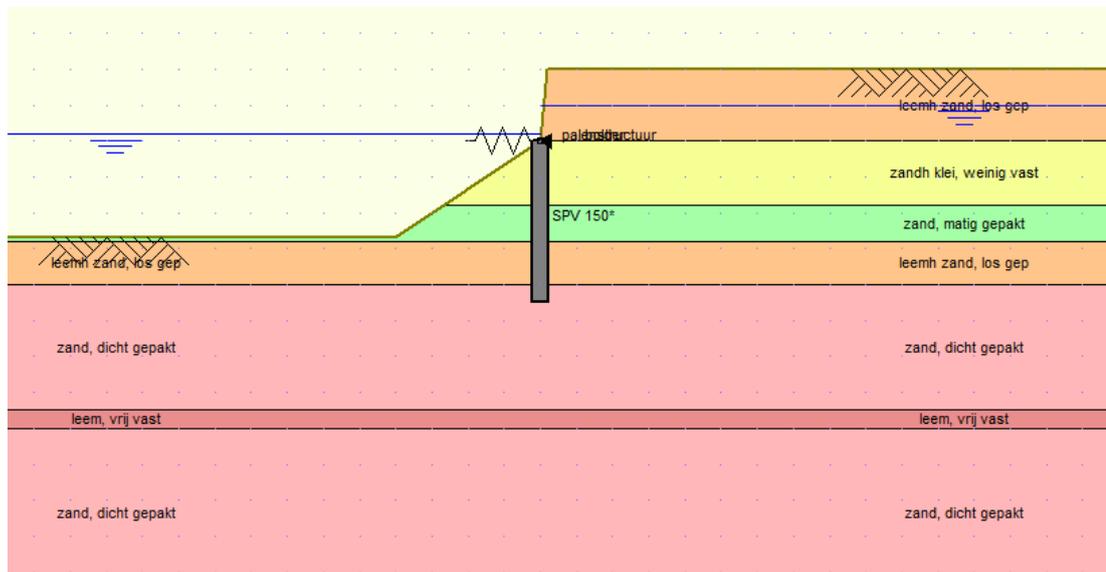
DSheet - Modeling sheet pile wall - Biestebroek Dock (source: Technum)
